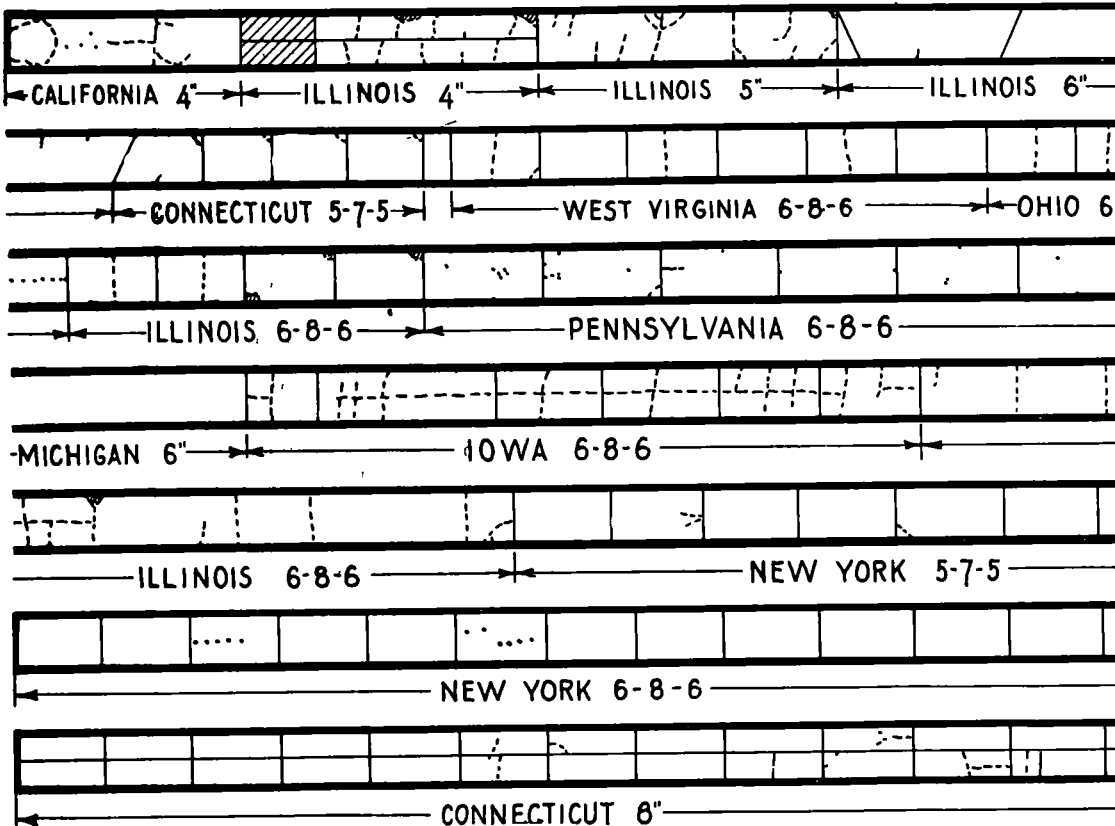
Summary sketches—reinforced slabs from same roads as sections shown in Figure 87
